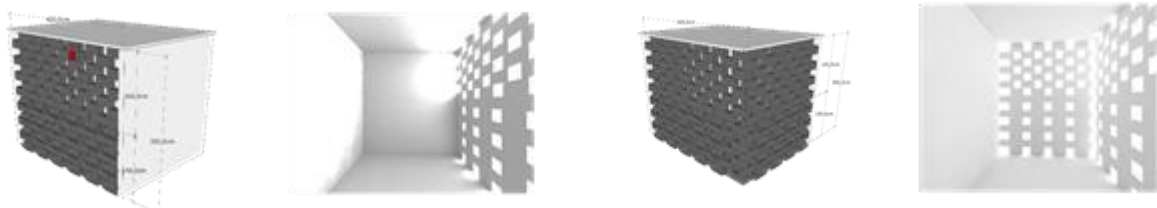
Room model, using modified design 4 with one-sided and two-sided opening walls
